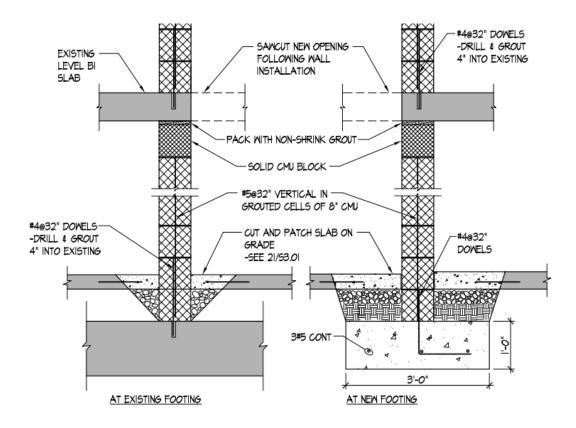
Section through new Load-Bearing CMU Walls. Existing slab was cut to allow walls to bear on existing footings. 1/S3.02
